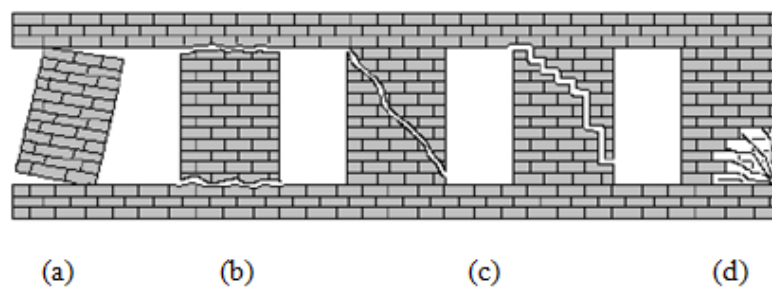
In-plane failure types of unreinforced masonry walls (a) rocking, (b) sliding, (c) diagonal tension, (d) toe crushing (Yi,2004)
